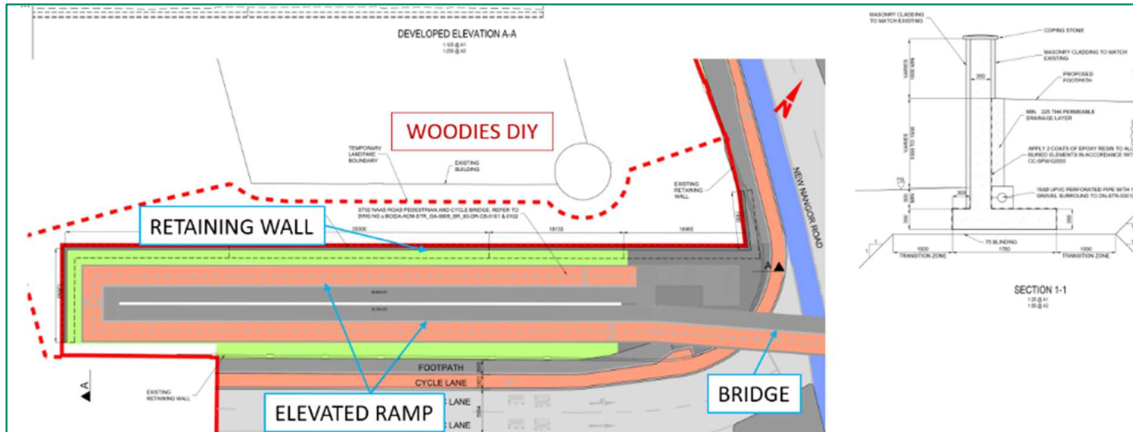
Extract of Bridges and Major Retaining Structures Drawings – RW05
